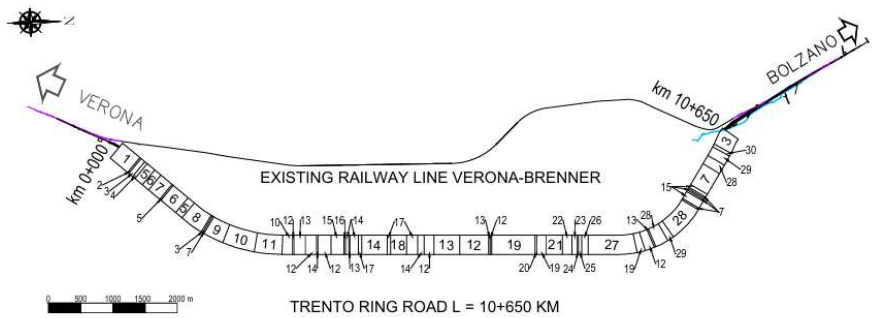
Plan view of the homogeneous sections along the tunnel chainage – Trento ring road tunnel
